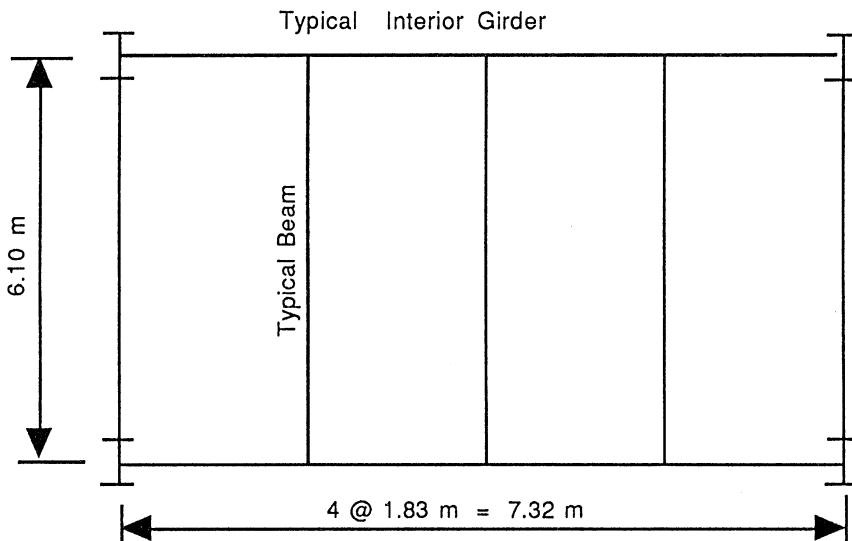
Typical interior girder with concentrated loads from typical beams.
